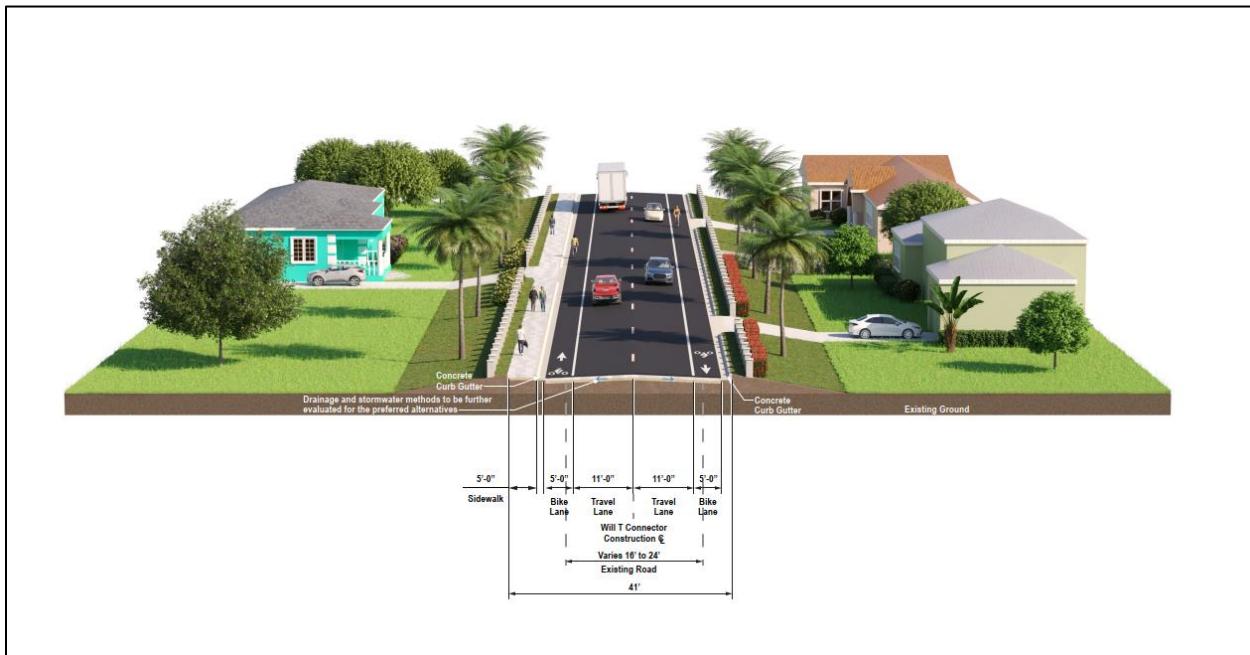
2026 Will T Connector Typical Section for Alternatives B1, B2, and B3
